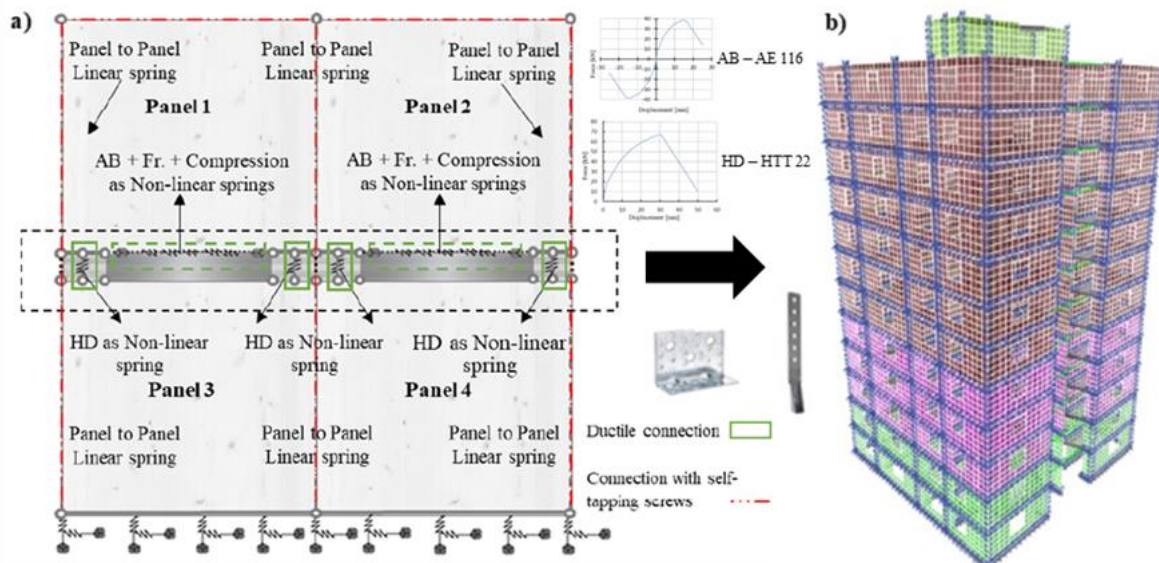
a) Proposed modelling principle and input parameters used for the shear-only and tension-only connection elements; b) Model application – a 12-storey case study building.
